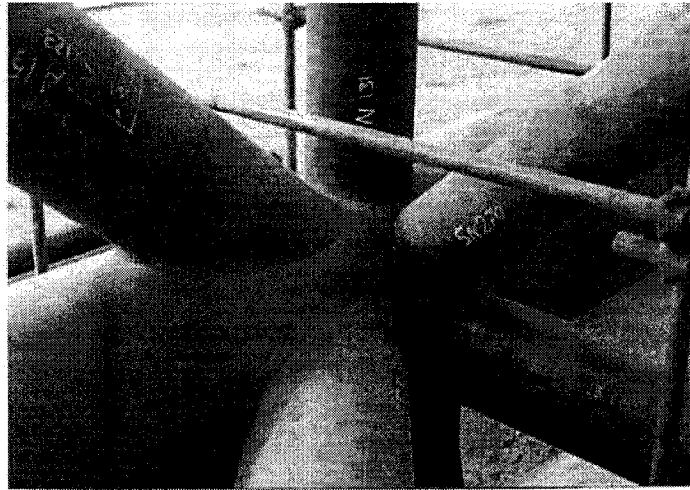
T-K-Y Pipe Joint in Steel Jacket Structure
